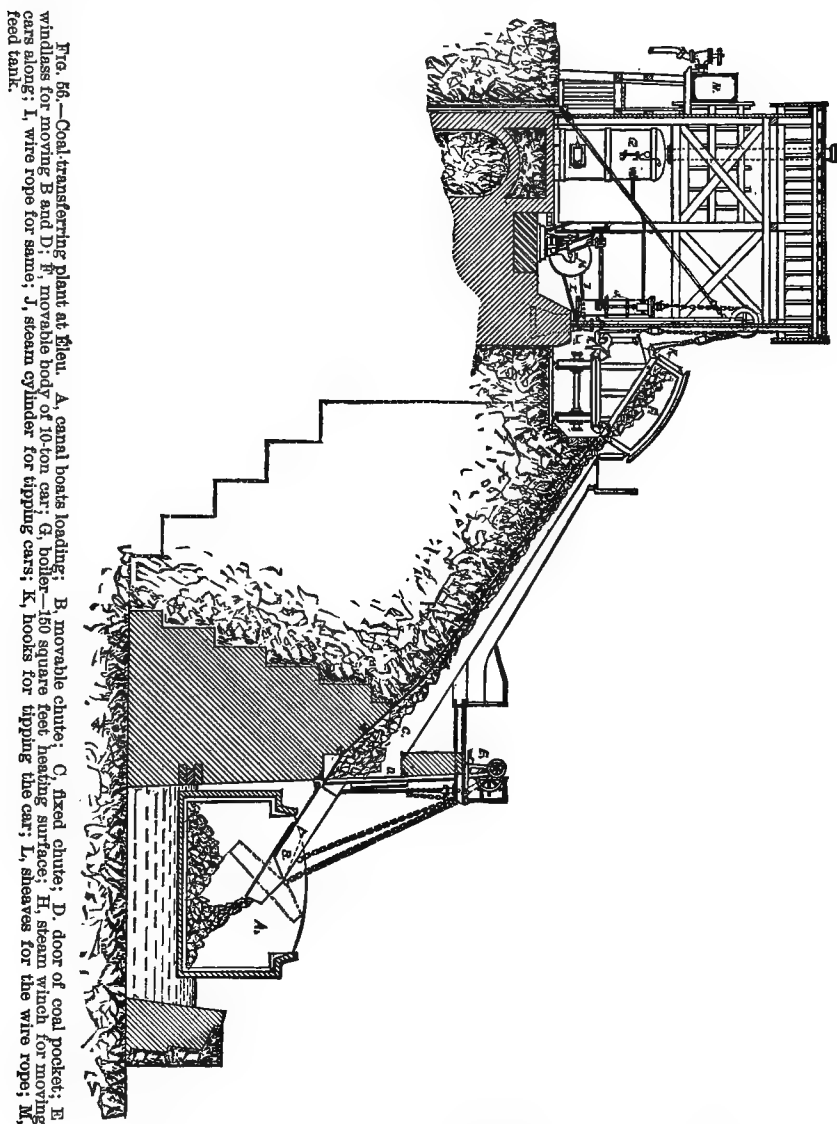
Coal-transferring plant at Éleu. A, canal boats loading; B, movable chute; C, fixed chute; D, door of coal pocket; E, windlass for moving B and D; F, movable body of 10-ton car; G, boiler—150 square feet heating surface; H, steam winch for moving cars along; I, wire rope for same; J, steam cylinder for tipping cars; K, hooks for tipping the car; L, sheaves for the wire rope; M, feed tank.
